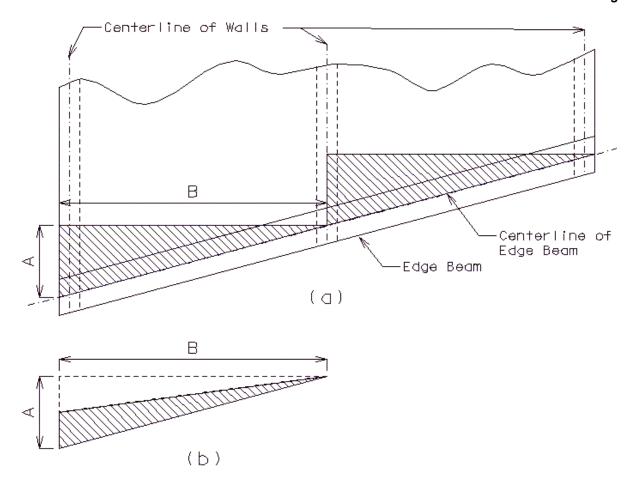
Partial plan view of double box culvert showing edge beam and dead loads (a) triangular hatched areas represent dead loads (b) half of dead loads to be carried by edge beam
